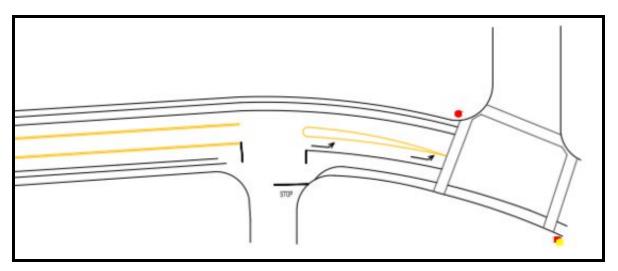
AutoCAD drawing of the intersection of Pruneridge Ave and Pomeroy Ave.
